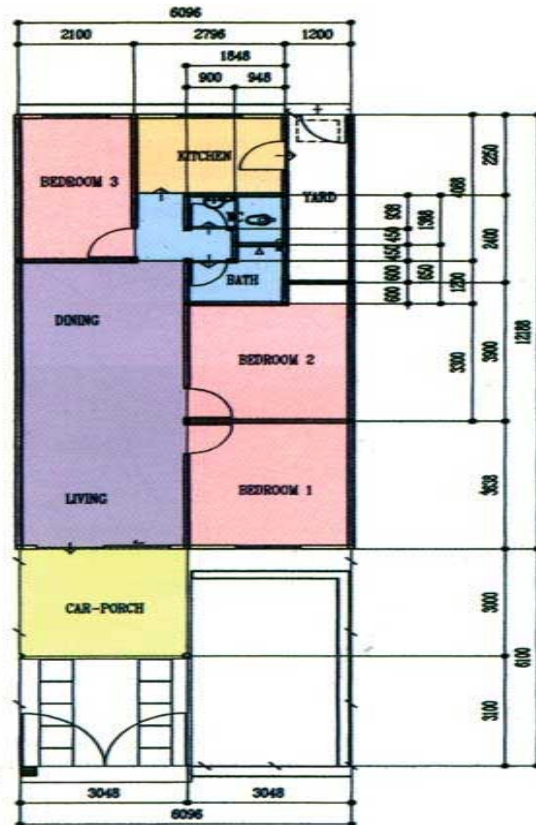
(left): Floor plan for the terrace house obtained online
